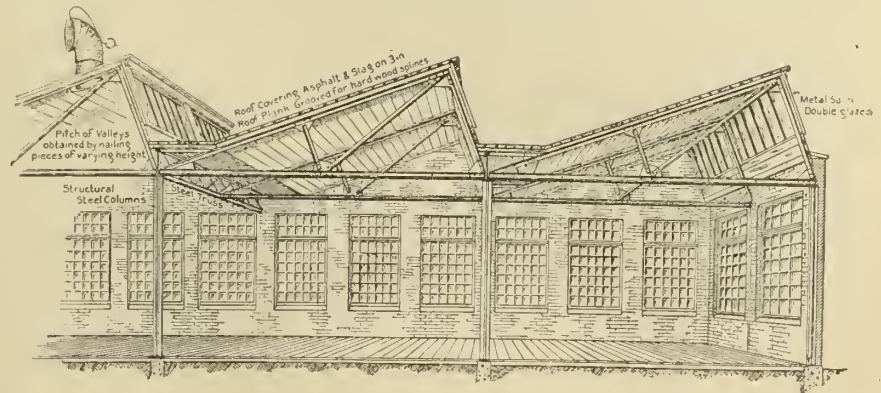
Saw-Tooth Roof, Recommended by Mutual Insurance Co. The Saw-Tooth Roof Construction is Used in Berlin Machine Works.
